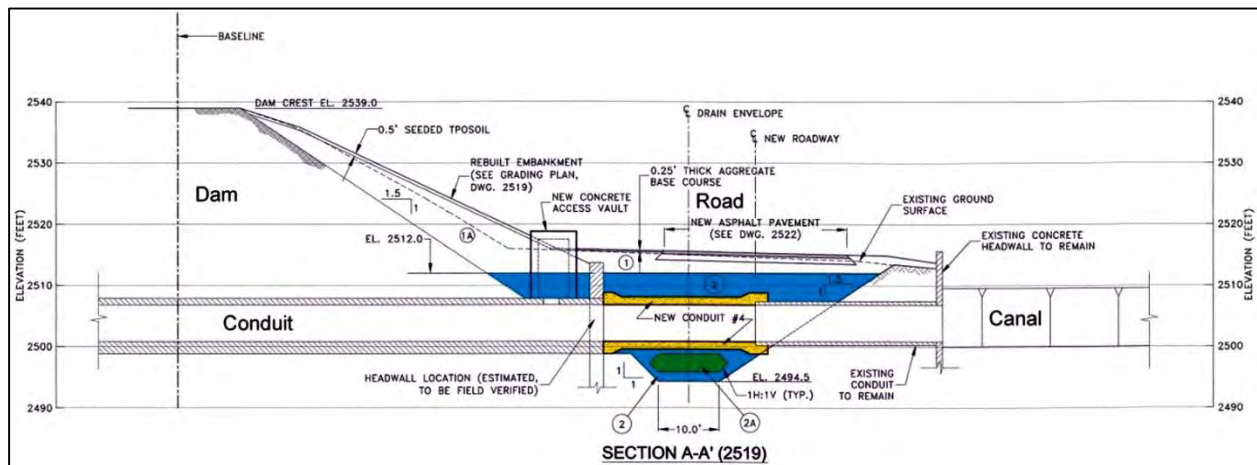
Example of filter diaphragm (with drainage zone) around a conduit near the downstream toe of a dam.
